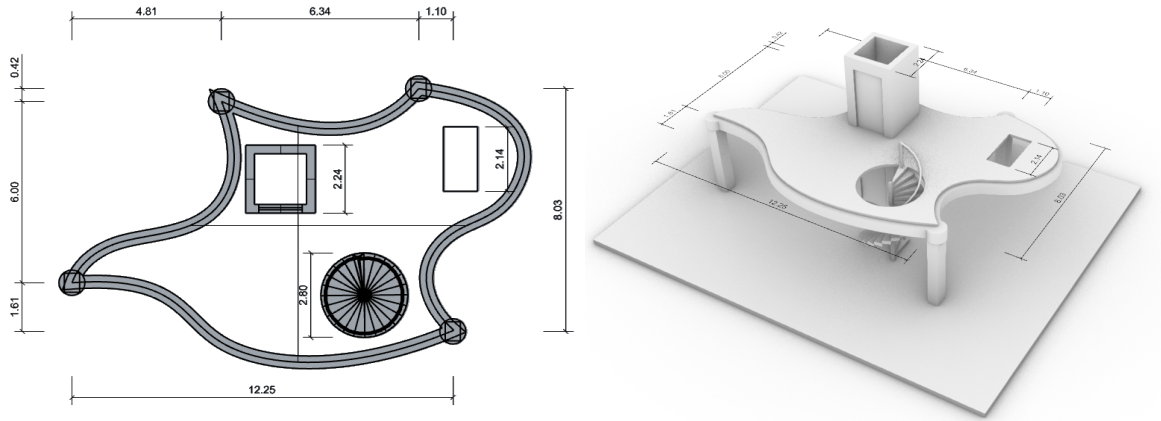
Definition and application of beam layout optimization based on architectural plan and column locations, Floor Plan (left), and perspective (right)
